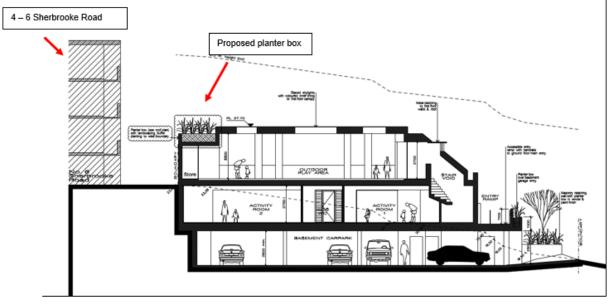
Cross section (setback along the western elevation shown) Source Manor House Design
